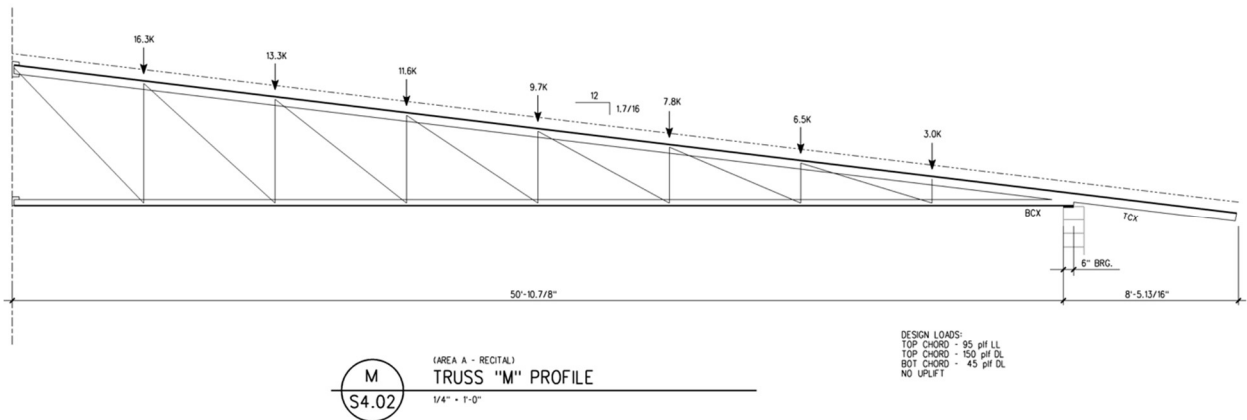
Truss M Profile from CFAC Roofs 2 and 3.
